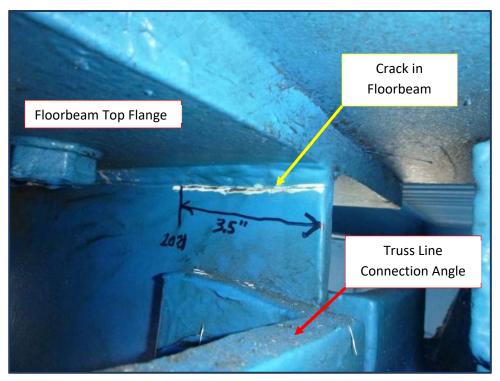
Cracks in Unit II Floorbeam Web at Top Flange, at Truss Lines
